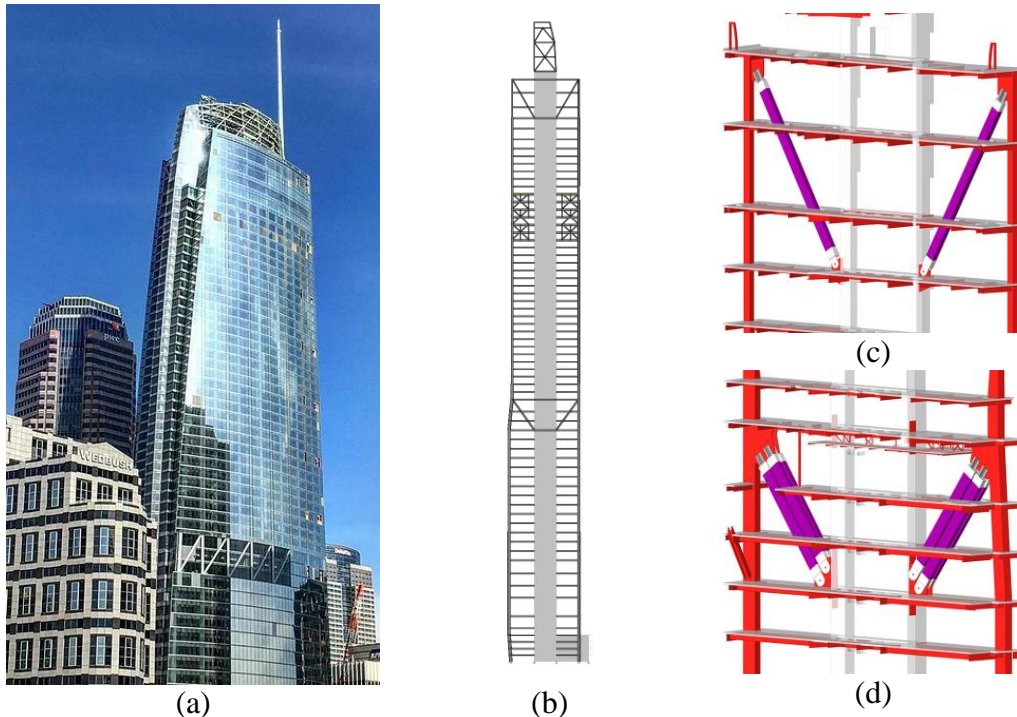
The (a) photo, (b) elevation, and (c) detail of the upper and (d) bottom outriggers
